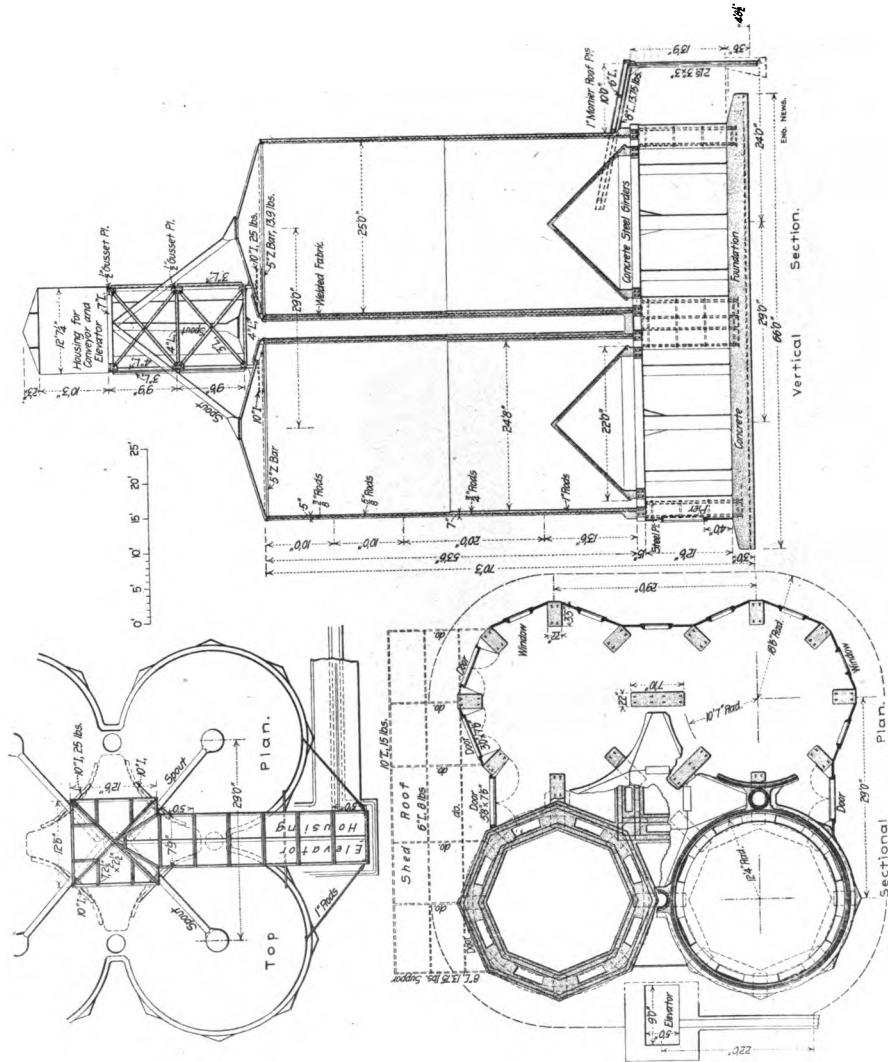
Plans of Cement Storage Bins, Illinois Steel Company.
